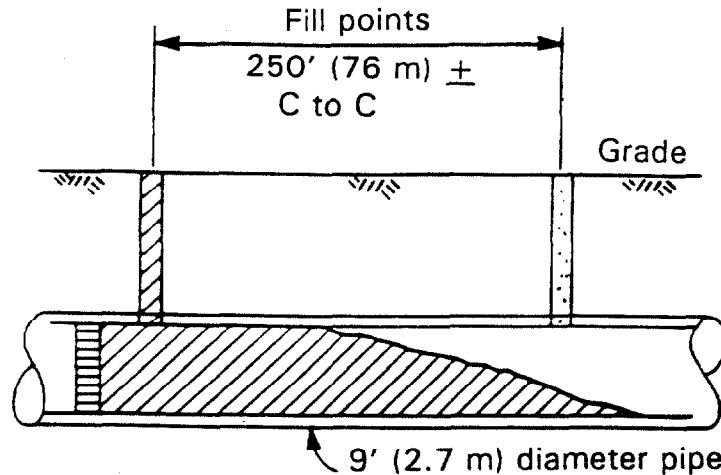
Structural fill of underground enclosures.<sup>(14)</sup>
